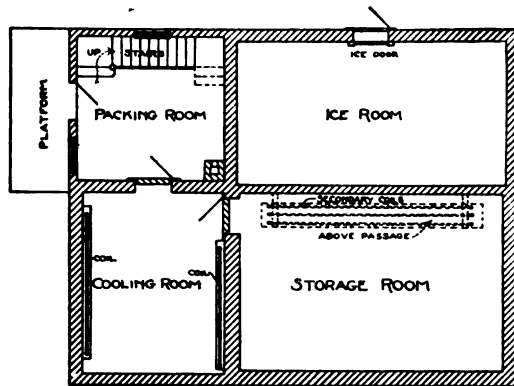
Horizontal section of a gravity-brine cold-storage house. This floor plan is adapted to an ice- or ice-and-salt-cooled plant.
